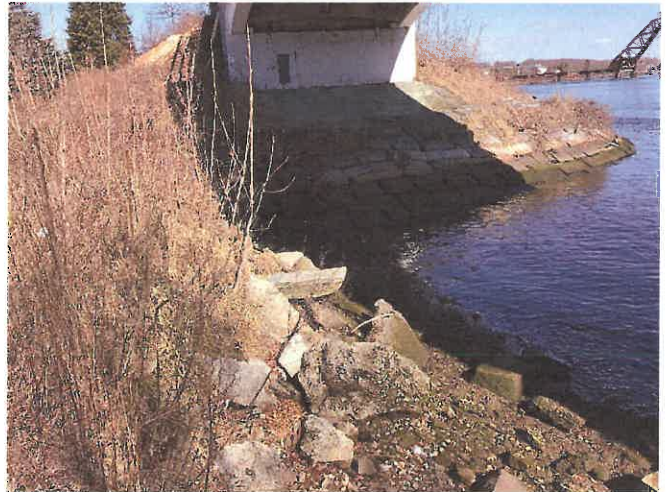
Northerly view of feature and stone armor protecting the earthen embankments of the Gano Street Off-Ramp. Photo was taken opposite the Off-Ramp pier shown in Photo 24.
